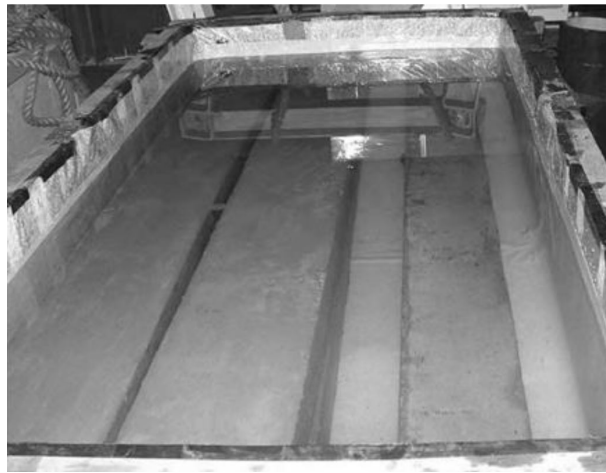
Submerged concrete specimens (Adiyastuti 2005)
